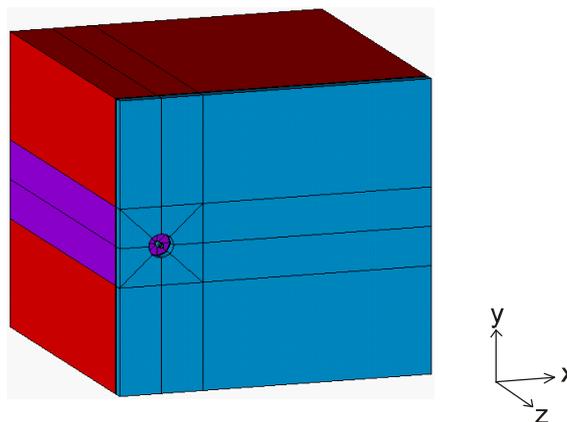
Scheme of anchorage area of masonry by numerical modelling
